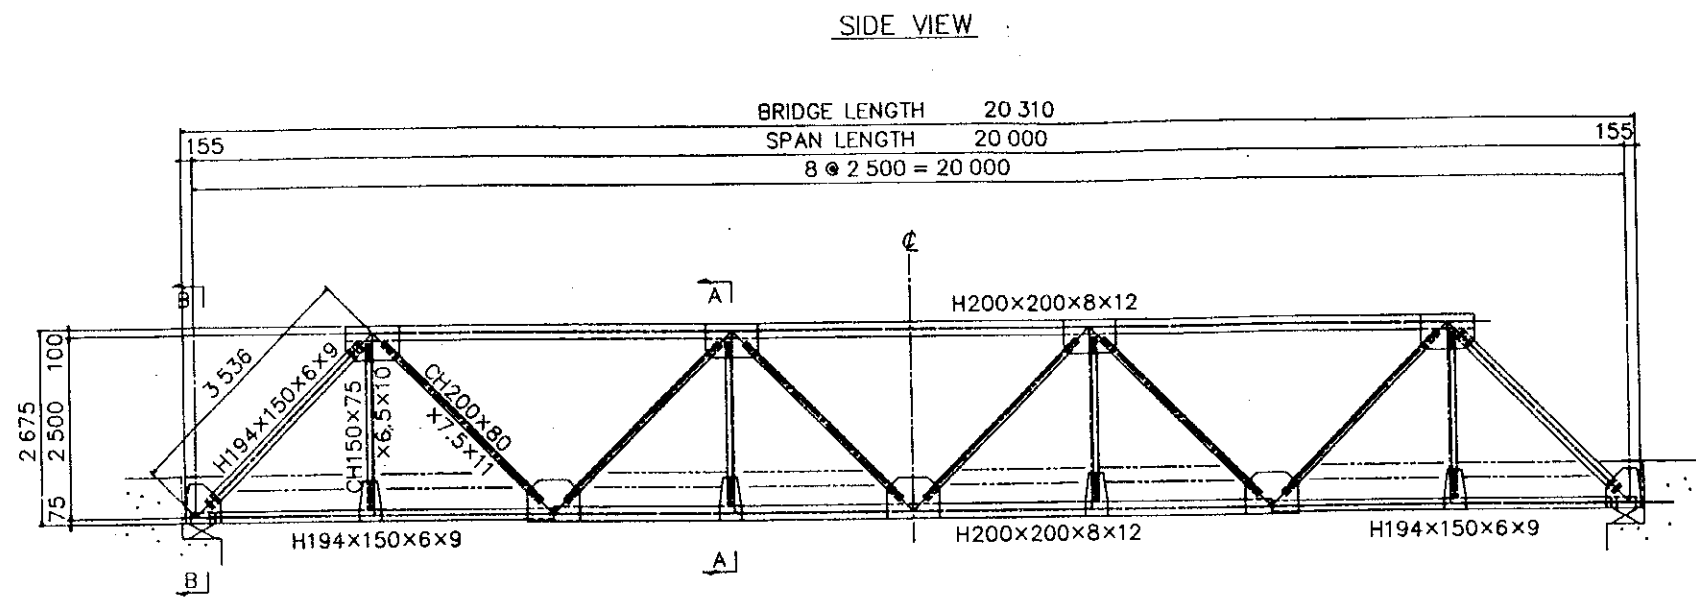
PREFABRICATED STEEL BRIDGE (1/3)
